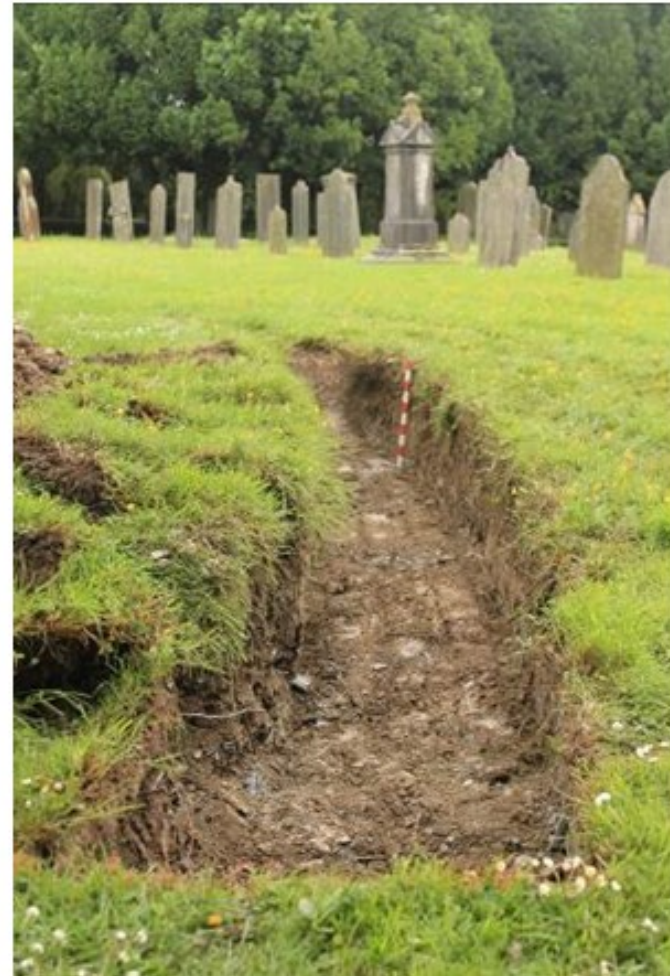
The new soakaway after excavation, looking northwest, with a 0.5m scale
